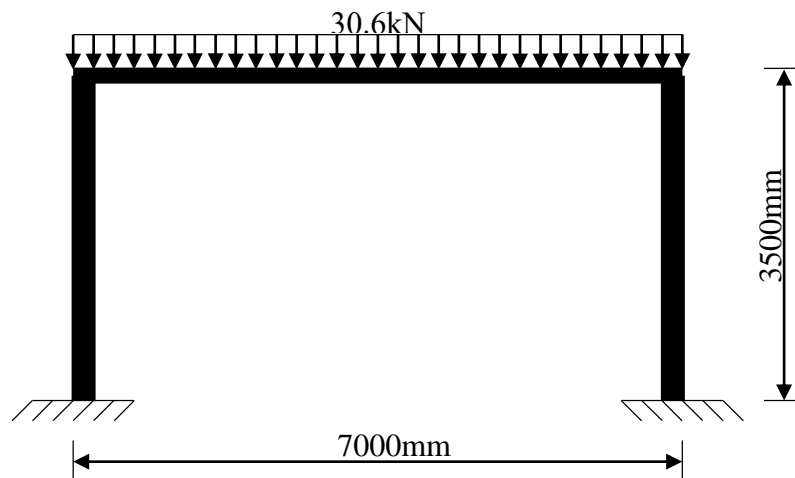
Sketch of the Proposed Single Bay Single Storey Frame
